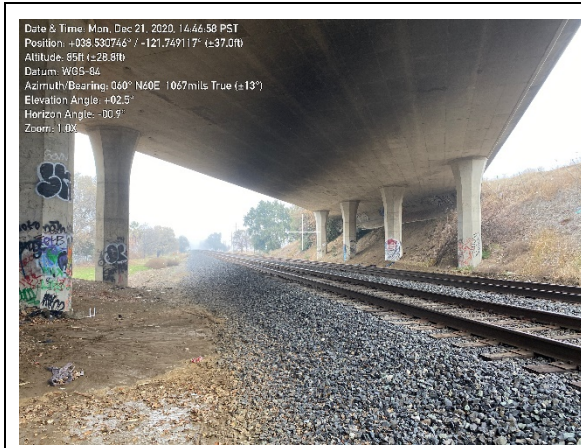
Habitat surrounding concrete box bridge with weep holes, consists of agricultural fields, roadside trees with dense clusters of leaves and crevices for roosting bats adjacent to the bridge, & UC Davis buildings (Location #16). Taken facing northeast.
